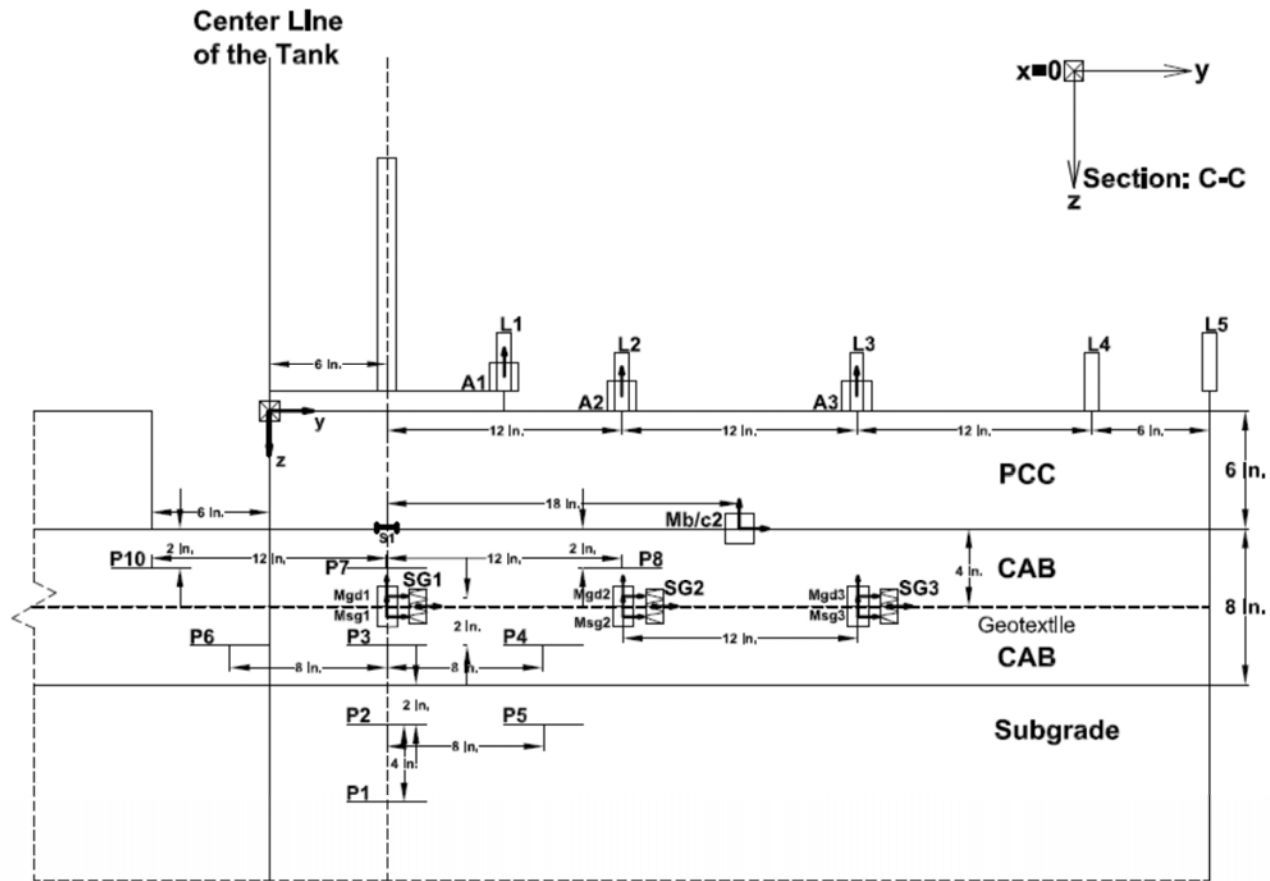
Instrumentation plan for experiment No. 10—Profile view, X=0 inch
